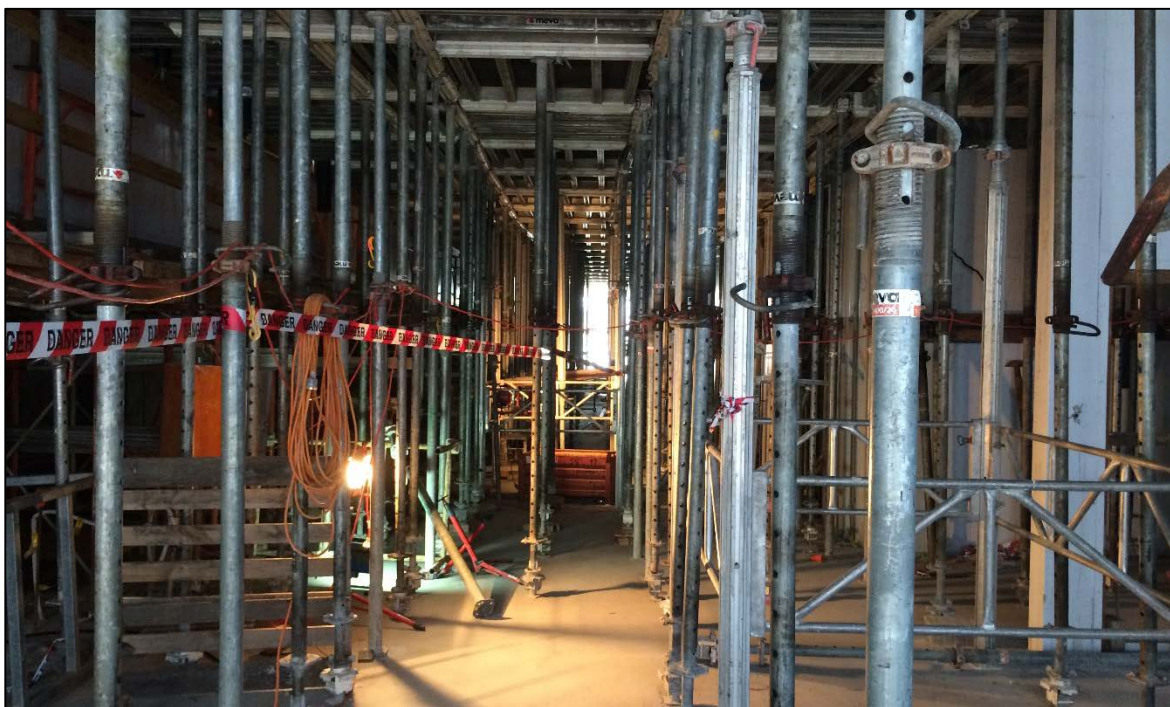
View from ground floor, through the site to Fleet Lane. The numerous support beams will remain in place for approximately 3 weeks following pour of the above concrete slab.
